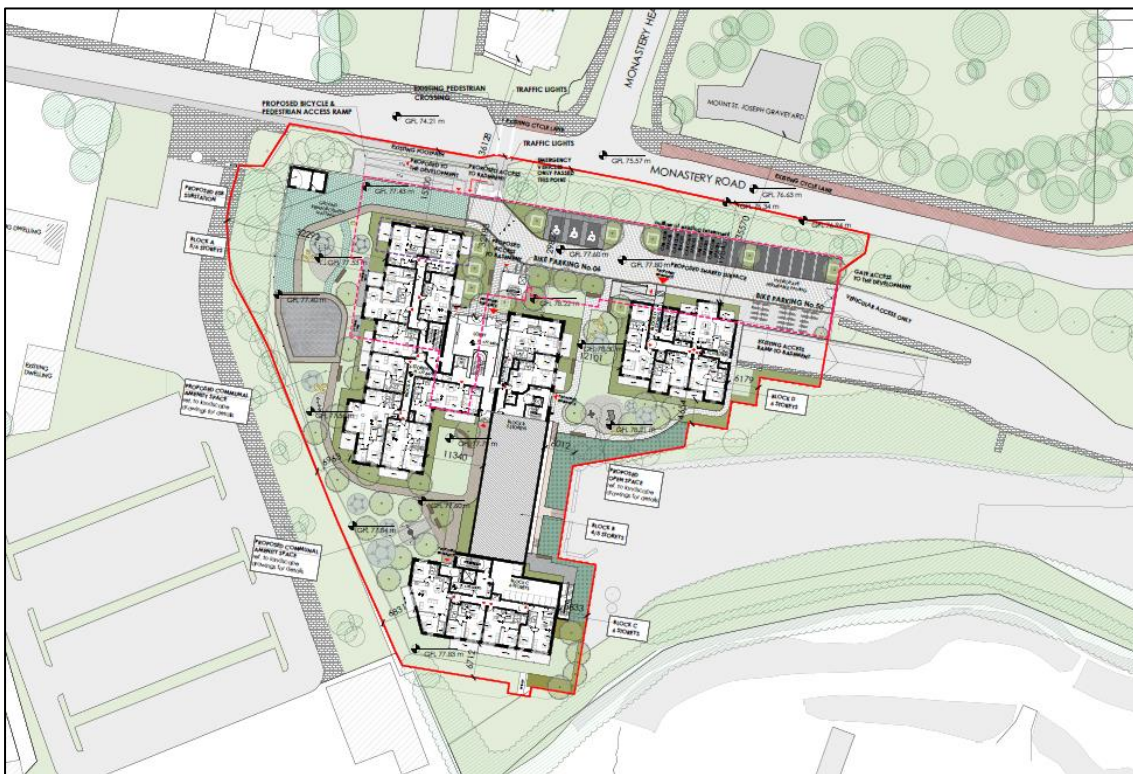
Proposed Site Layout Plan Option B – no footpath proposed
